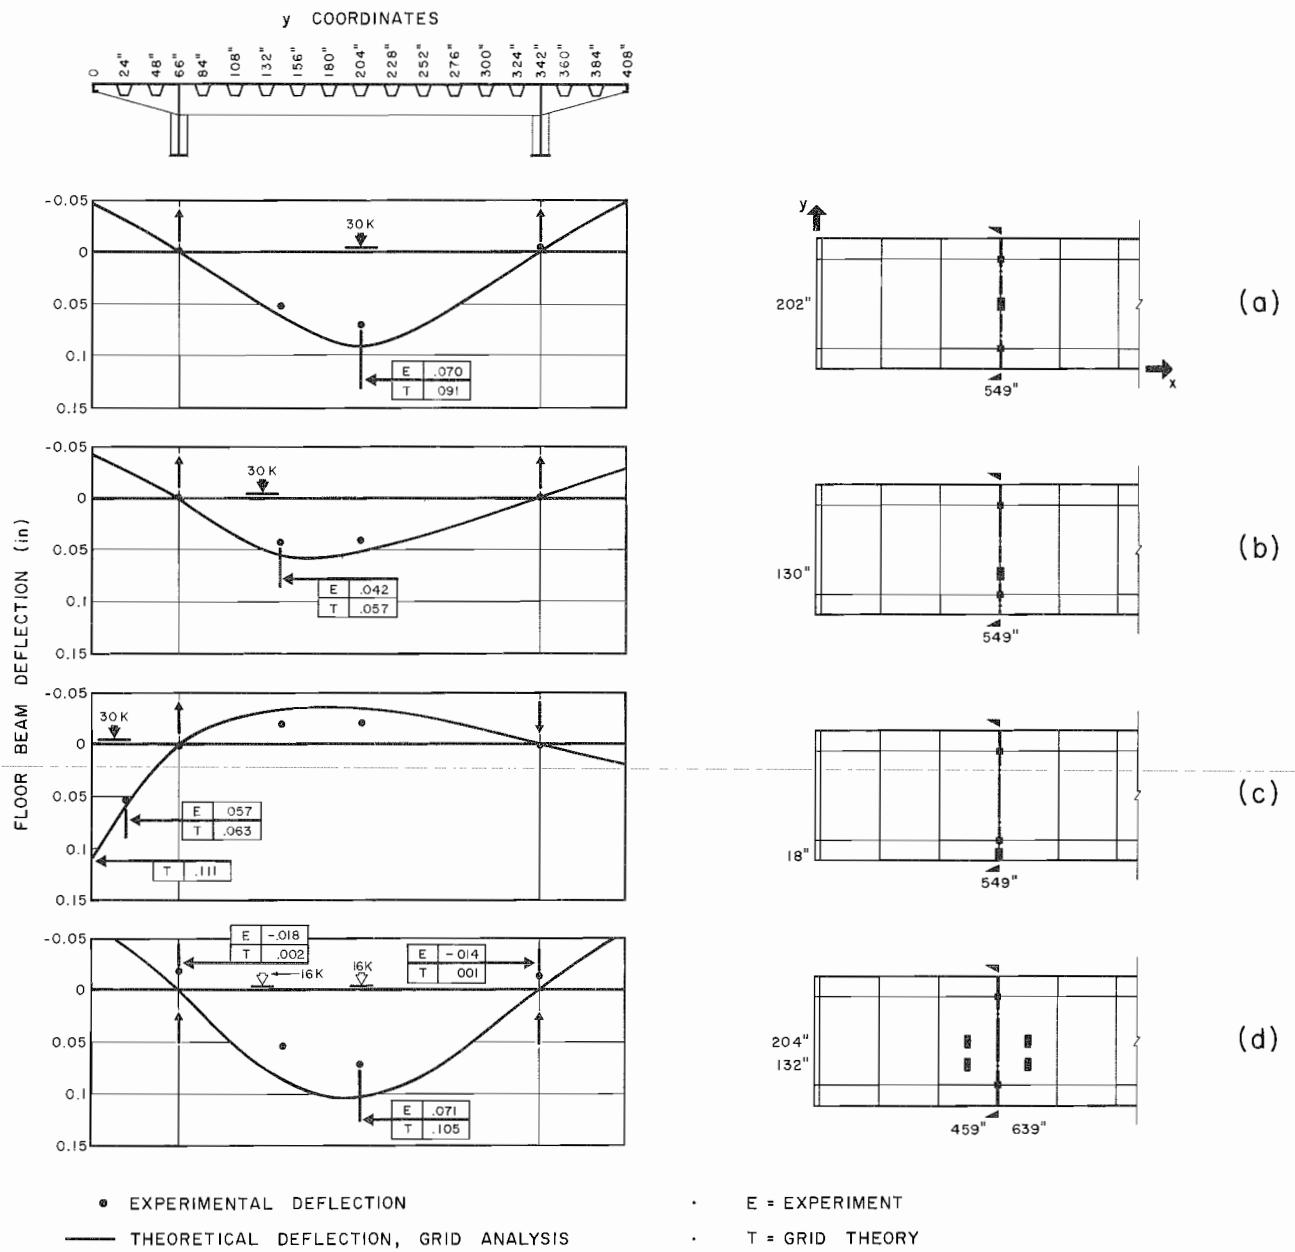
INTERIOR FLOOR BEAM DEFLECTIONS, BRIDGE I.
